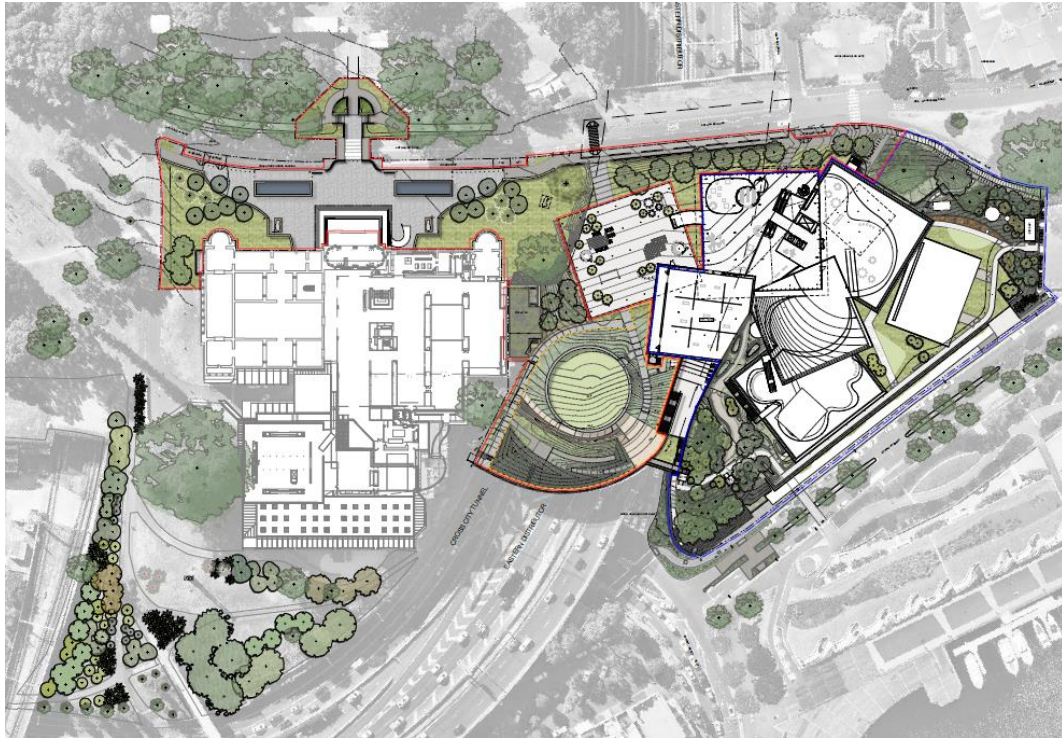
Art Gallery of NSW Expansion Sydney Modern Project, Landscape Master Plan (Drawing No. LD_DA_00-02). (Source: Art Gallery of New South Wales)
